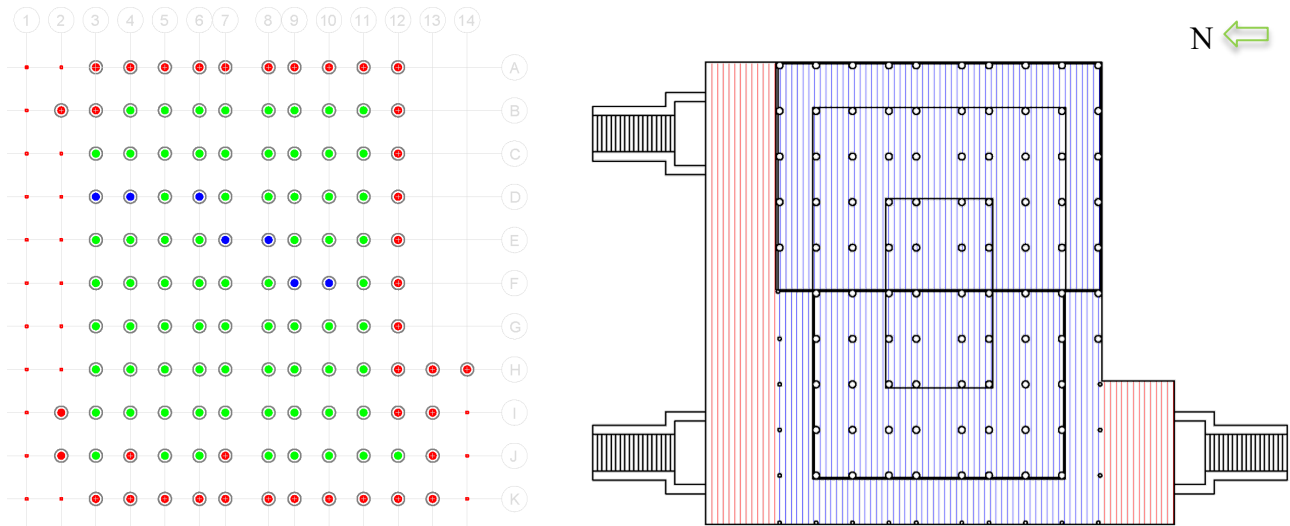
Wooden posts and floor plan. Source: Drawn by author, 2022.
